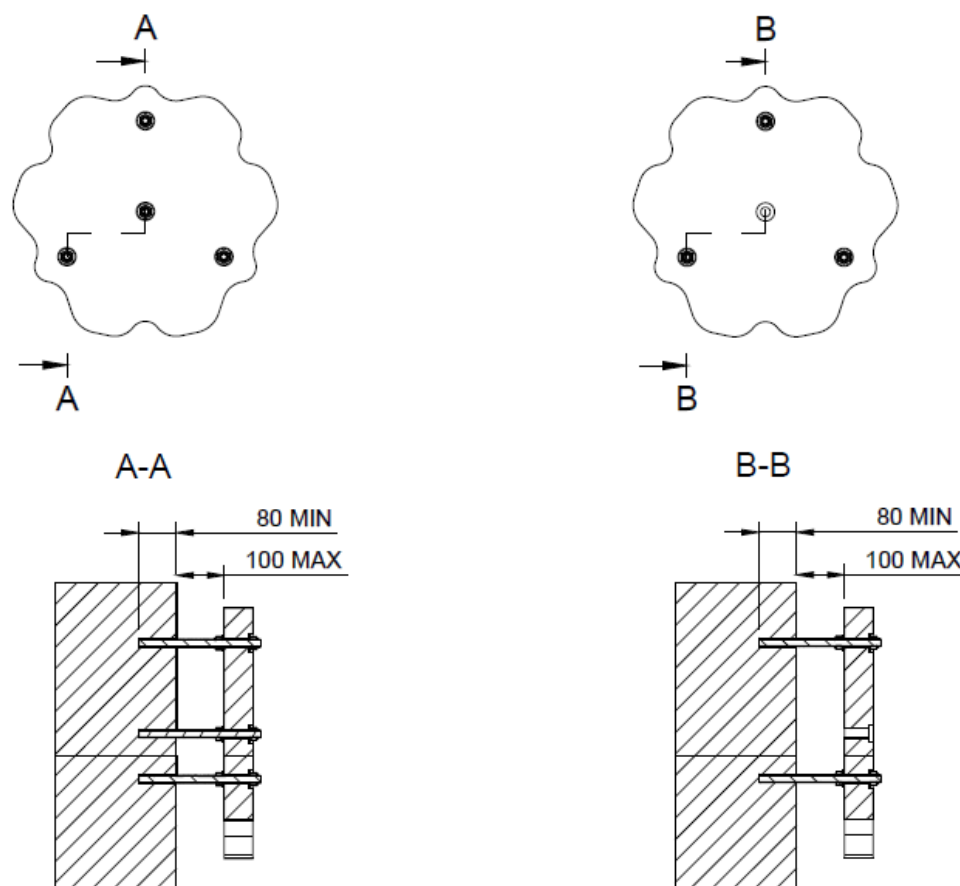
A) Installation of the habitat panels using all four installation points. B) Installation of the habitat panels using the triangle formation, with the top and outside installation points used.
